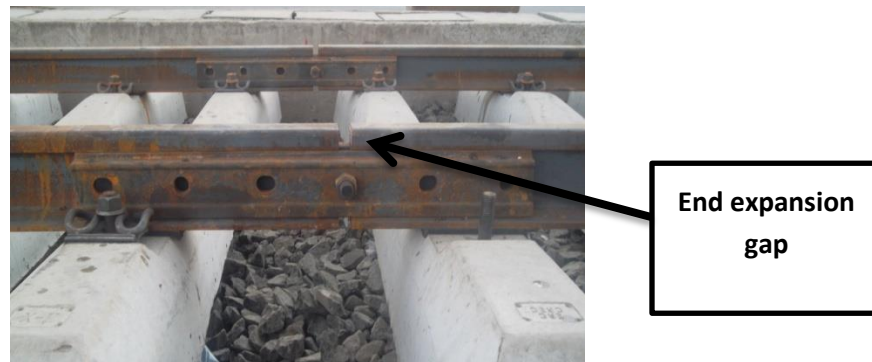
Standard rail joint of Ethiopia LRT. [32]
